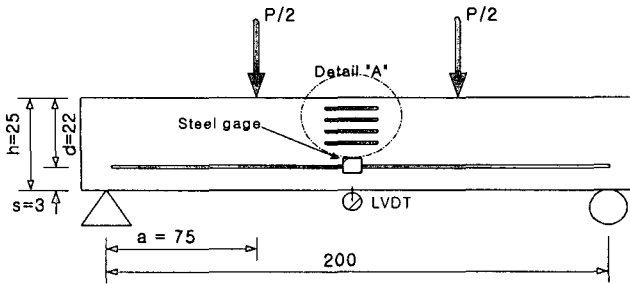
Test Set-up for 4 Point-loading (unit : cm)
